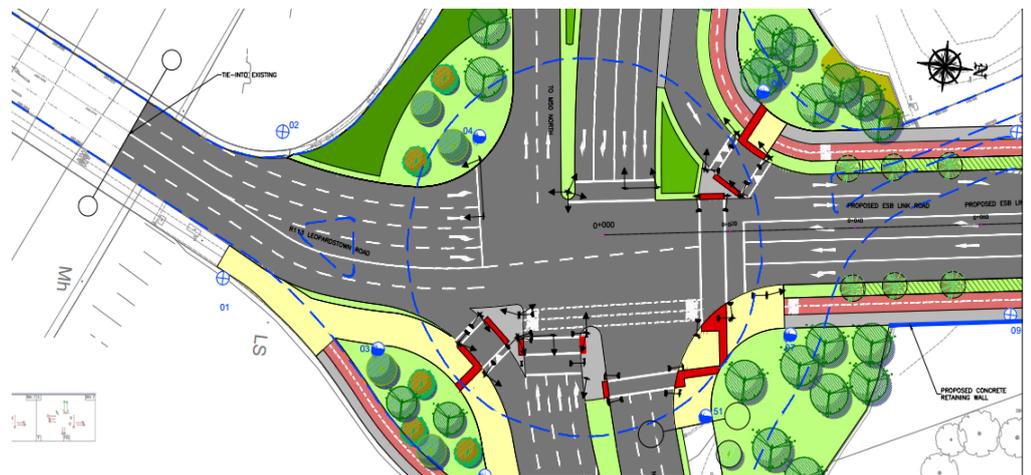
Proposed new junction layout at Murphystown Road and ESB Link Road
